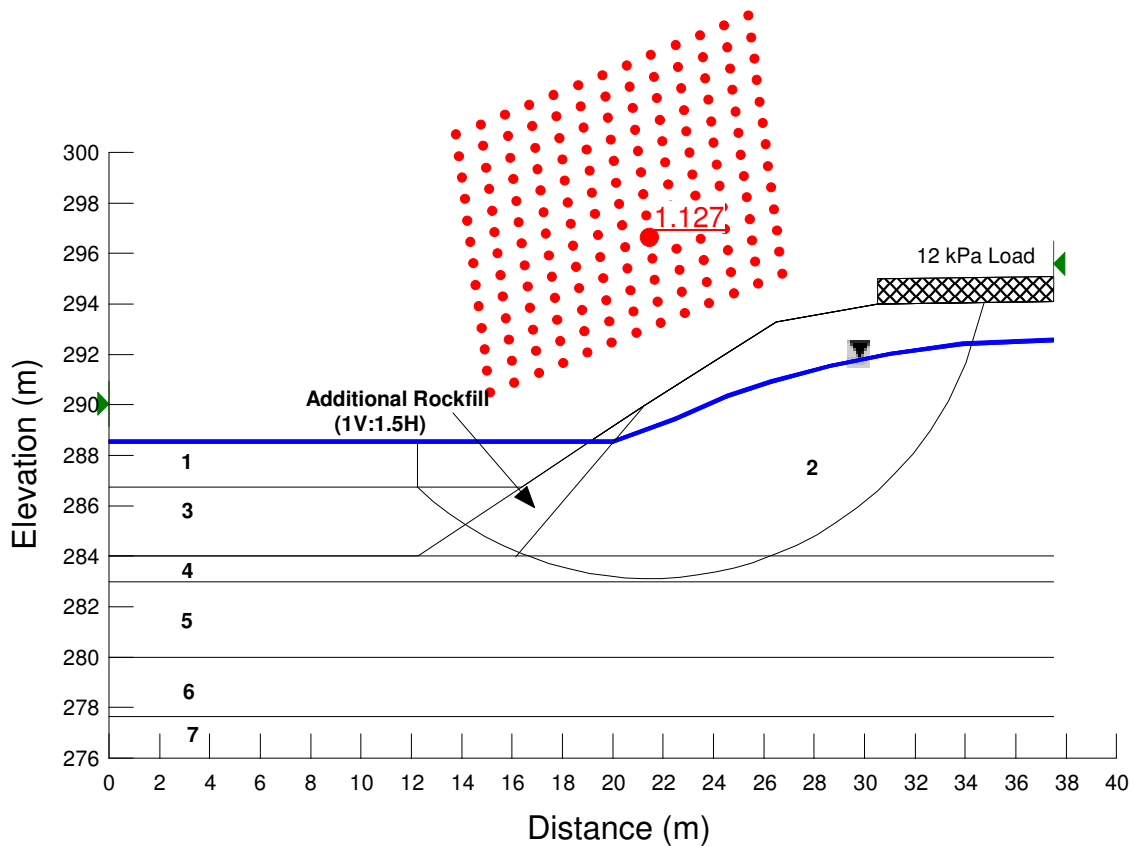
Stability of HWY11 Road Section at Sta. 14+800
